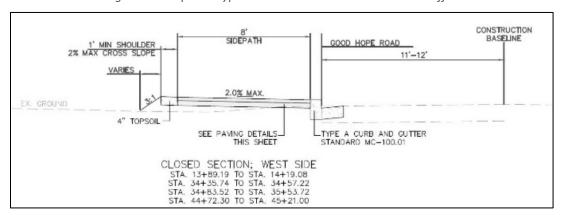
Proposed Typical Cross Section Design – West Side Intersection Pinch Points
